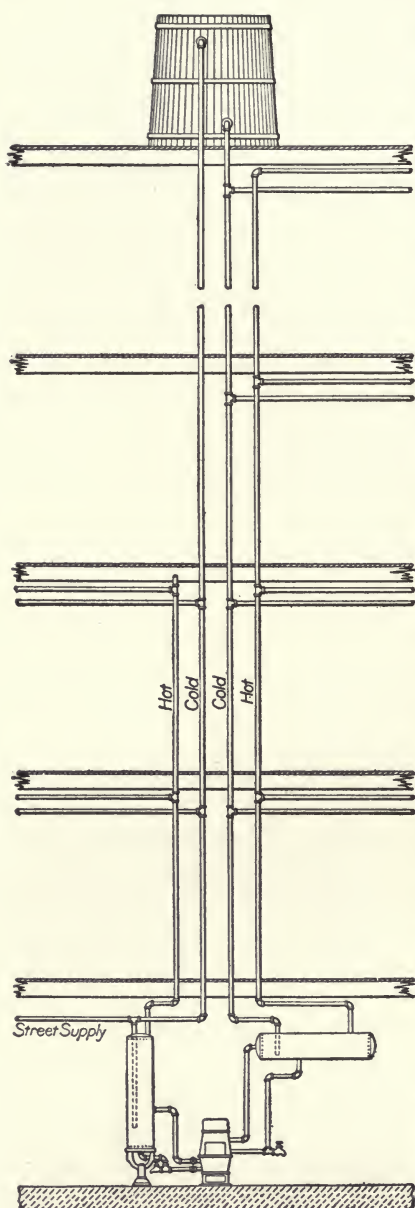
Method of Piping a Residence from a Double Section Water Heater.
